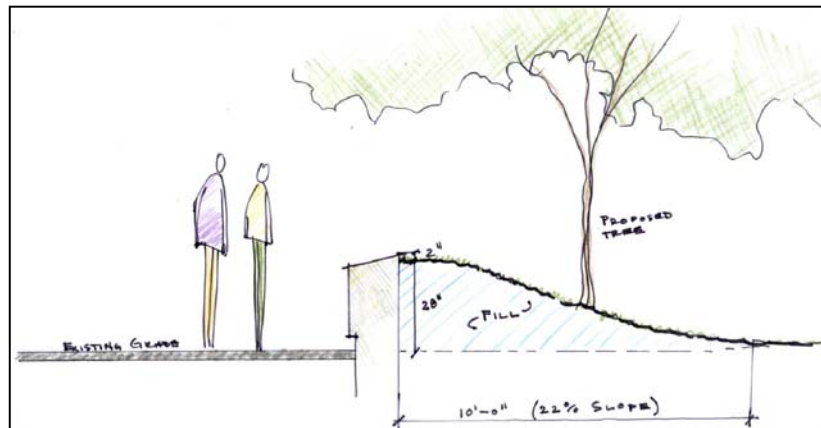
Schematic profile drawing of the vehicular barrier wall at the west and east sides of the Memorial.
